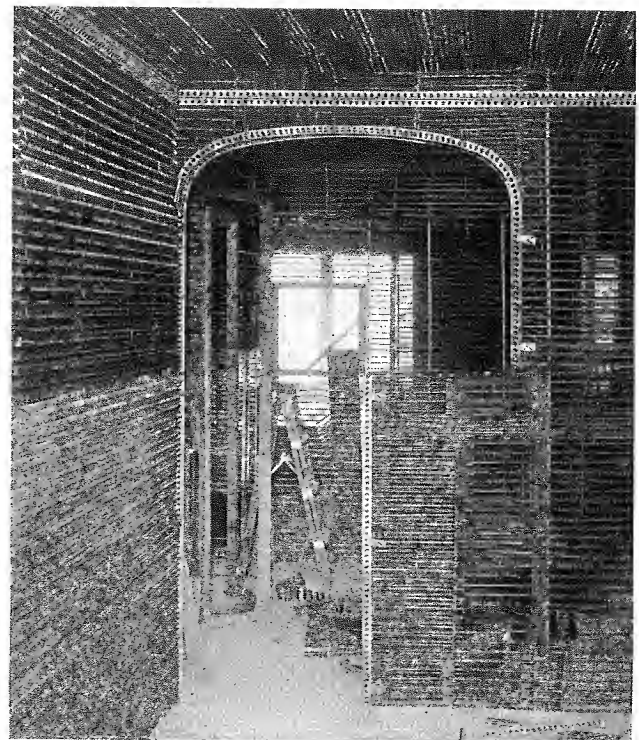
Installation of Metal Picture Mold and Corner Bead for Arched Cased Openings in Apartment Unit. Prefabricated Metal Arch Installations Similar.
